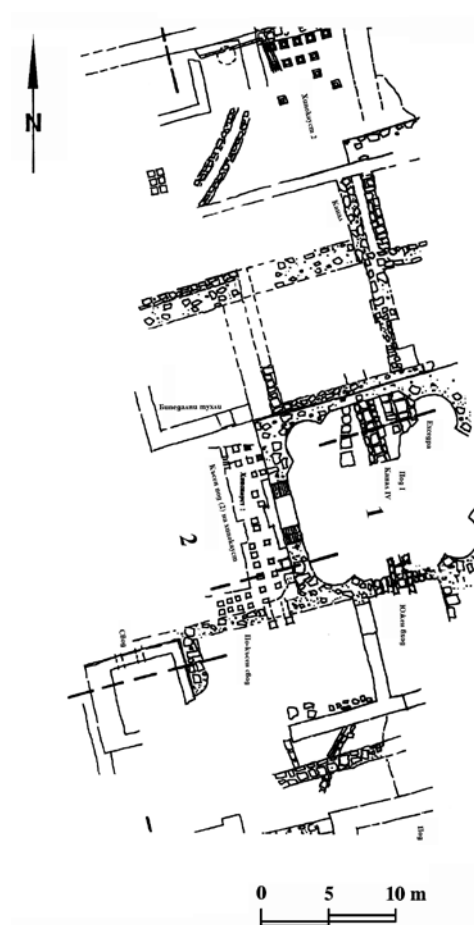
Plan of building in the foundations of block of flats Yavorov 1-2 Sedmi septemvri str.
